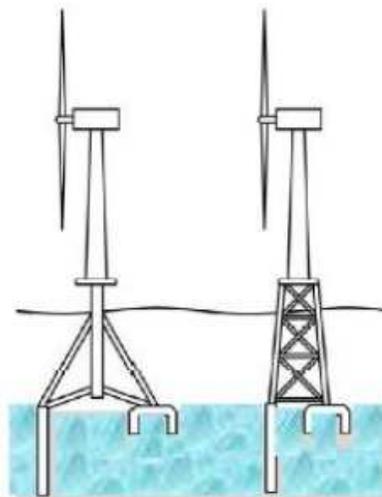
Multipod foundation (Tripod and Jacket type). [38]
